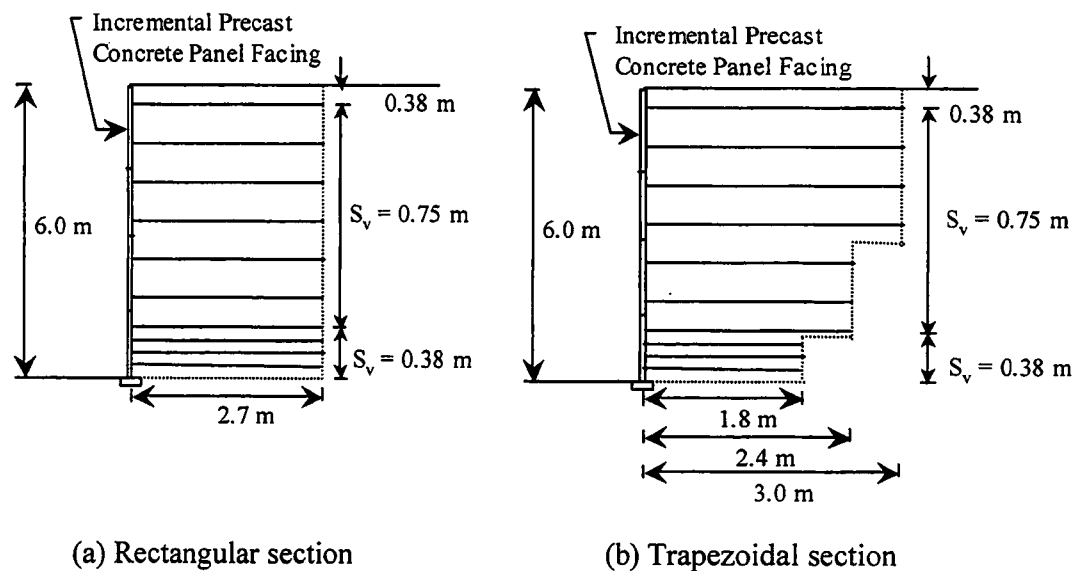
Millville, West Virginia, steel strip MSE walls (adopted from Bastick, 1984).
